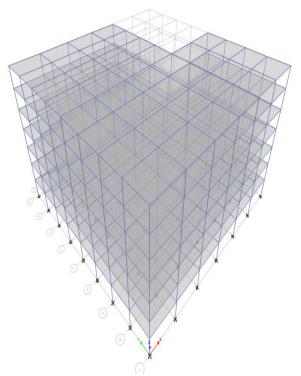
Three Dimensional view of G+6 Fixed base RCC Frame Building
